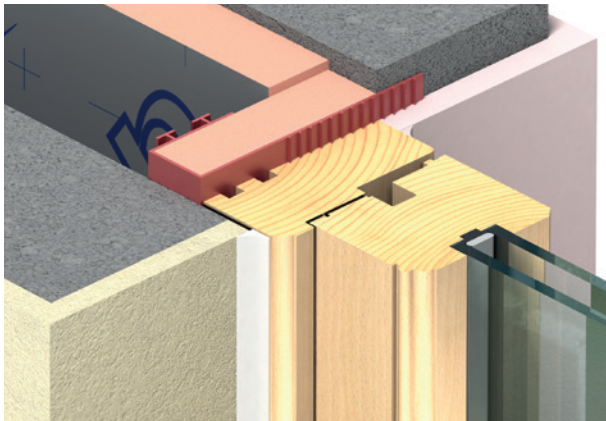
Kingspan Kooltherm® Cavity Closer at a Check Reveal
